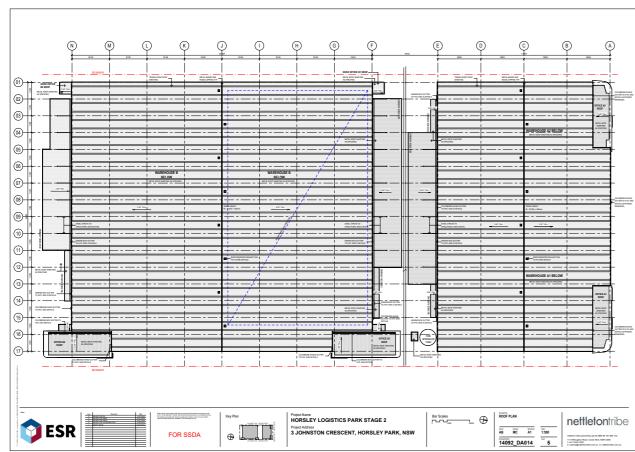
Warehouse - Roof Plan (Source: Nettletontribe)
